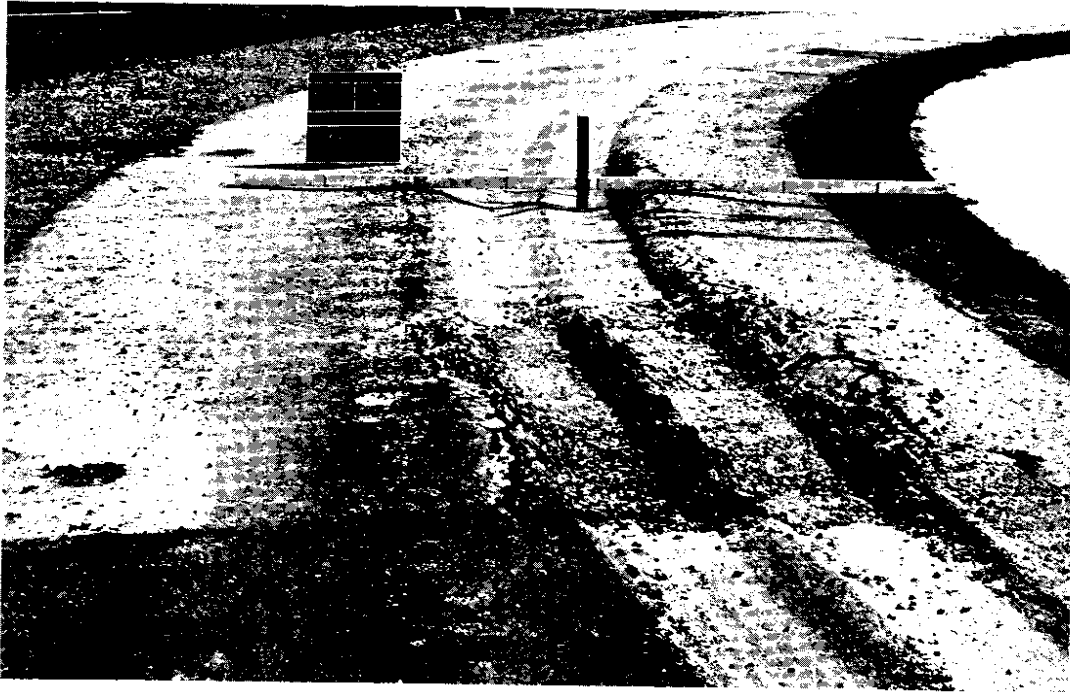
"ULTIMATE FAILURE" AT SECTION 6 AT 158,235 WHEEL LOADS--
